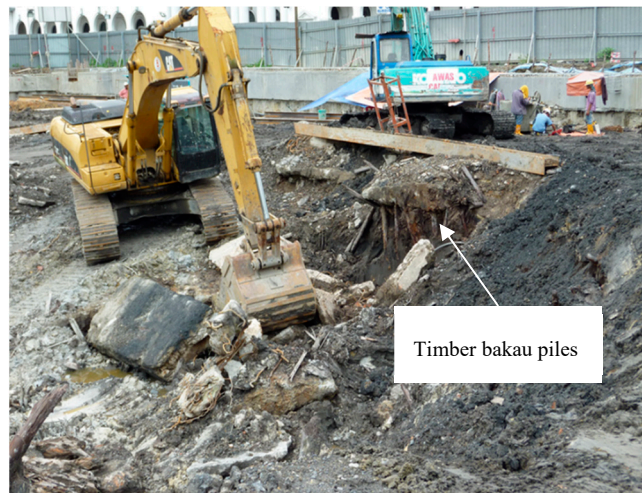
Timber bakau piles used as support system for the demolished buildings.
